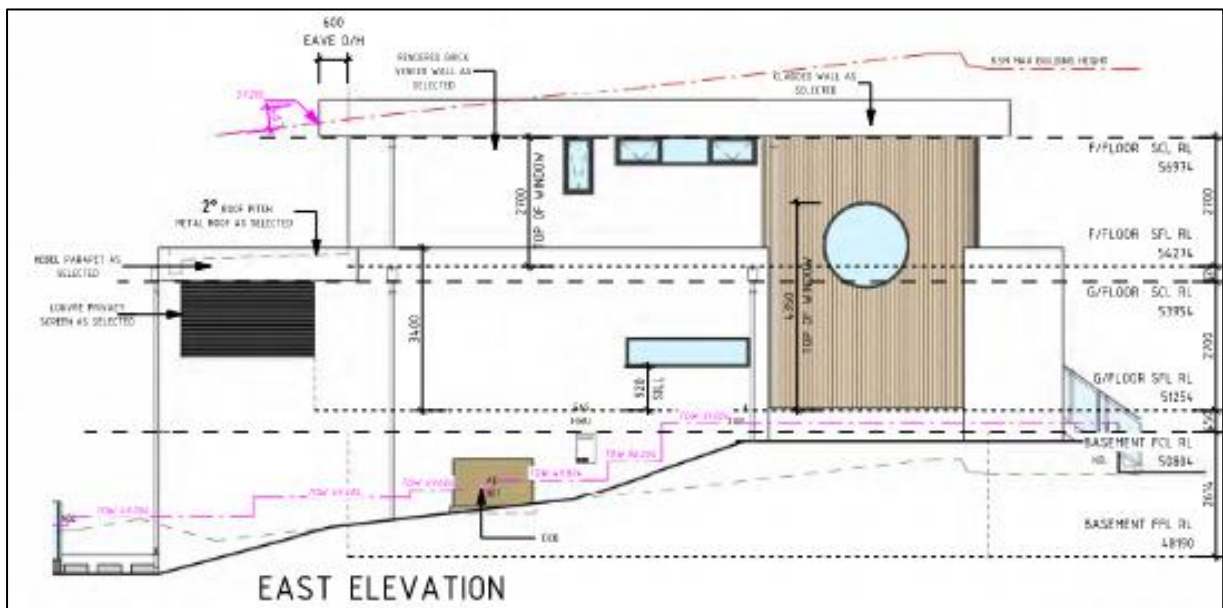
Proposed exceedance to Clause 4.3 of NLEP2012 (east elevation)
